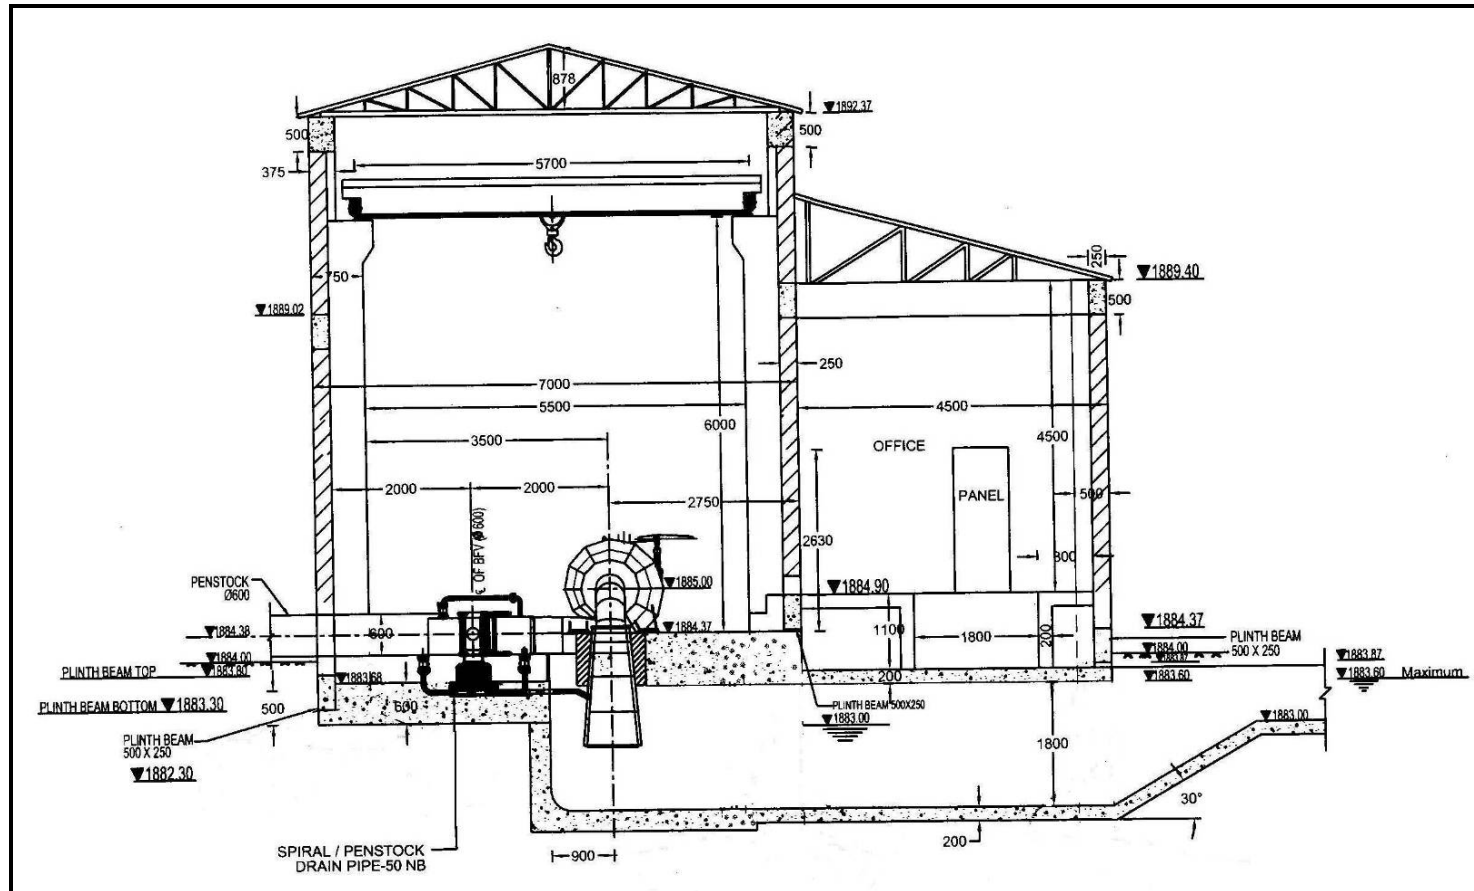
Typical Transverse Section of Power House with Horizontal Francis Turbine
